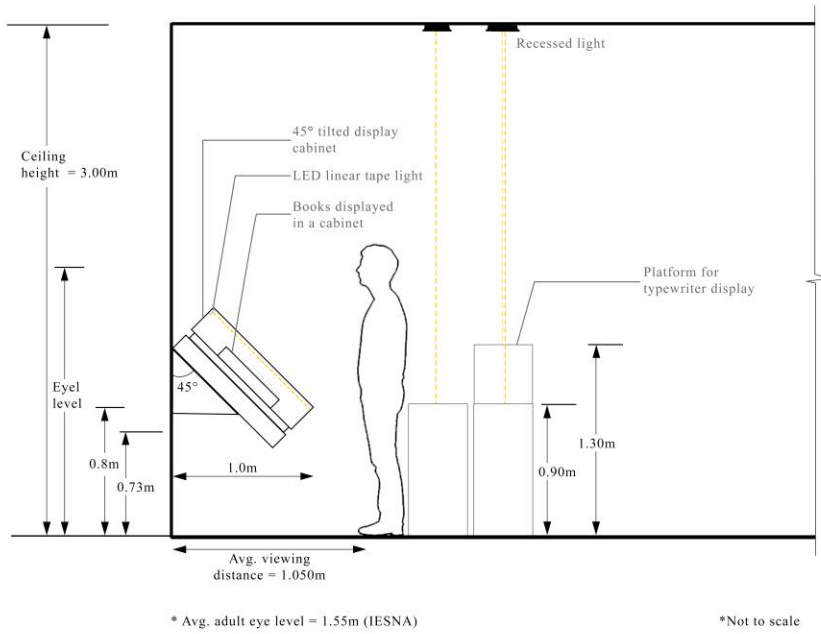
BB' Section – The mounted luminaire details in Room 2
